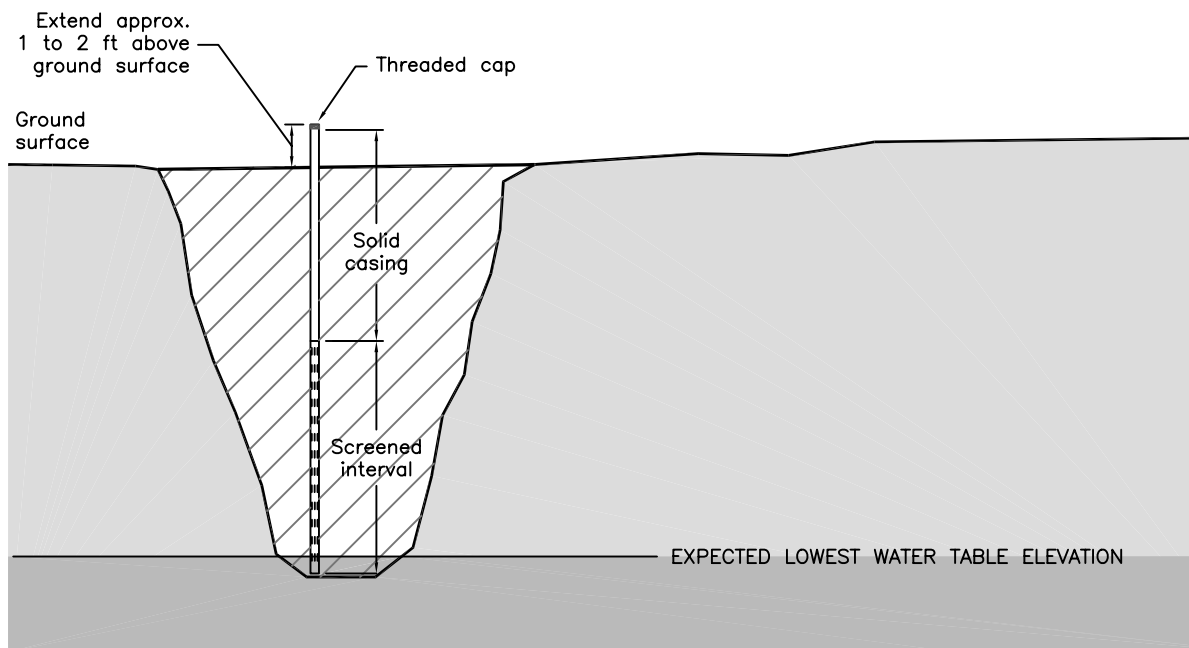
Schematic drawing of test pit excavation and piezometer installation methods.
